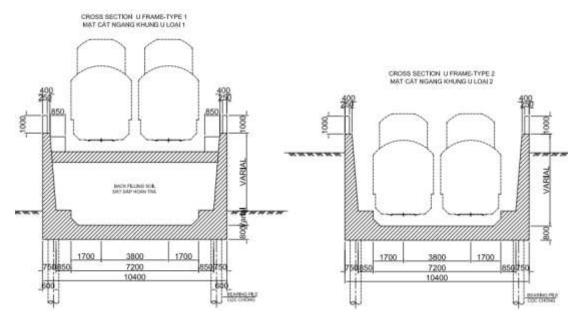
Cross Section of U Frame Using Cut & Cover Method
